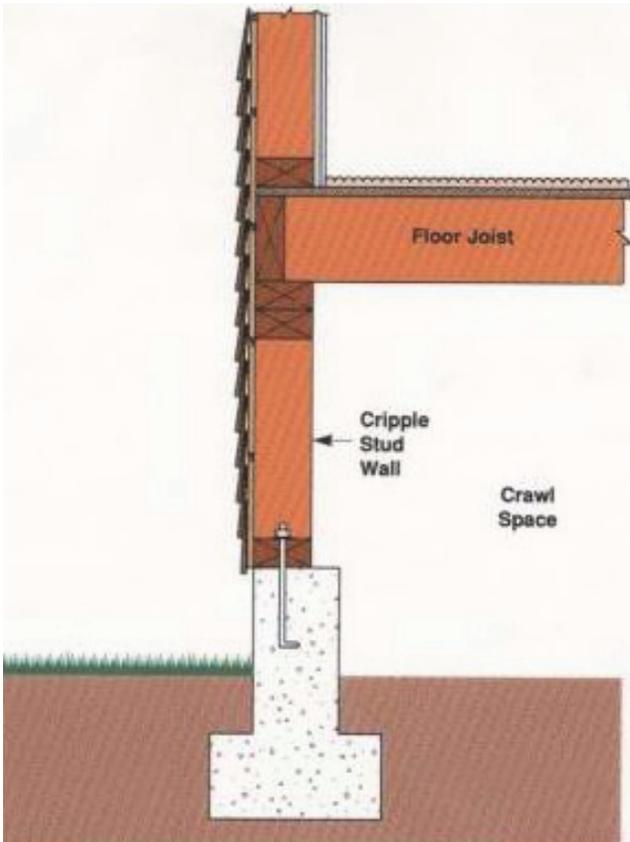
Continuous footing supporting wood-frame cripple wall (image credit: Exponent).
